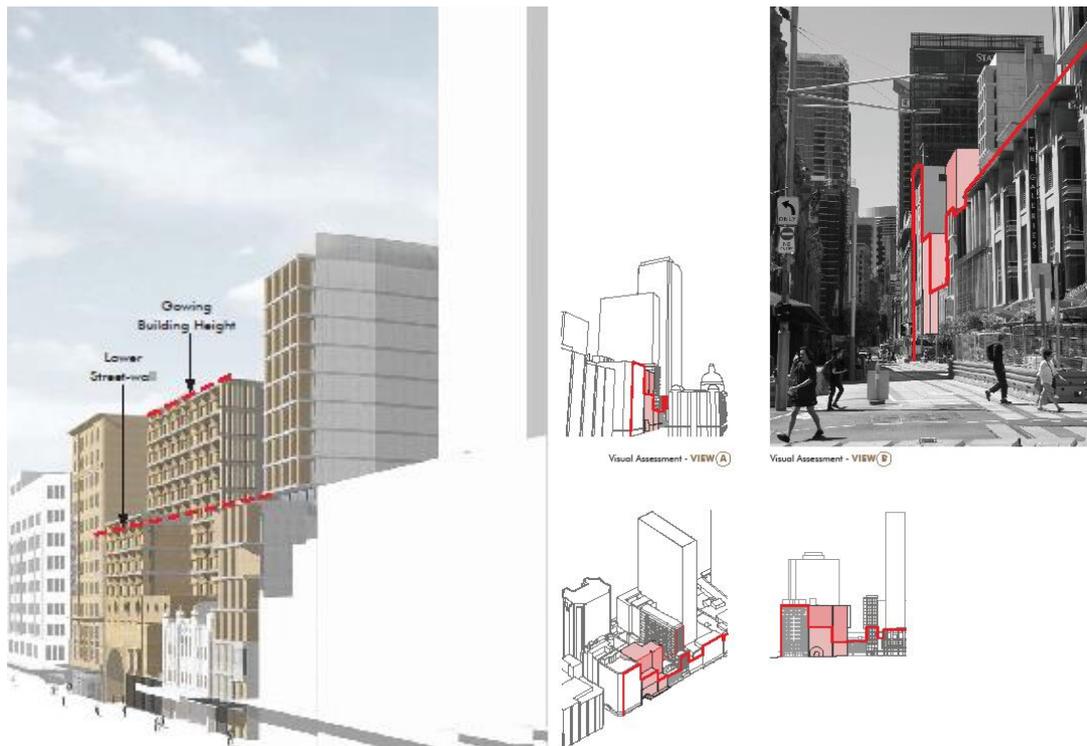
Extract from 'Facade Design Development Report (Candalepas Associates), showing an option matching the Gowings building height, street wall height and setbacks of buildings to the south
